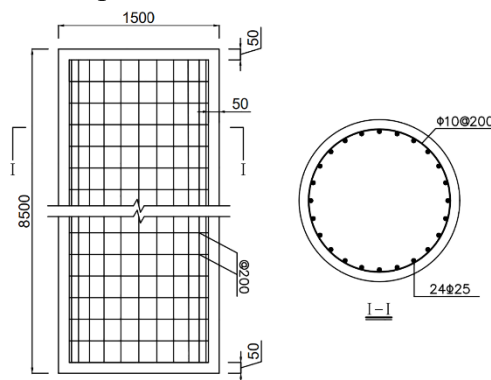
Pier size and reinforcement diagram (Unit: mm)
